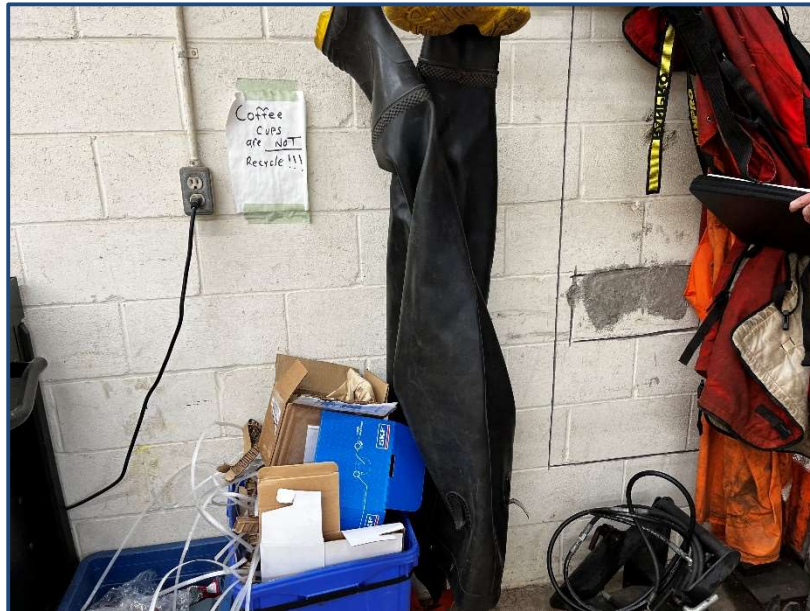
Cracking at Southeast Corner of Garage Block Wall
